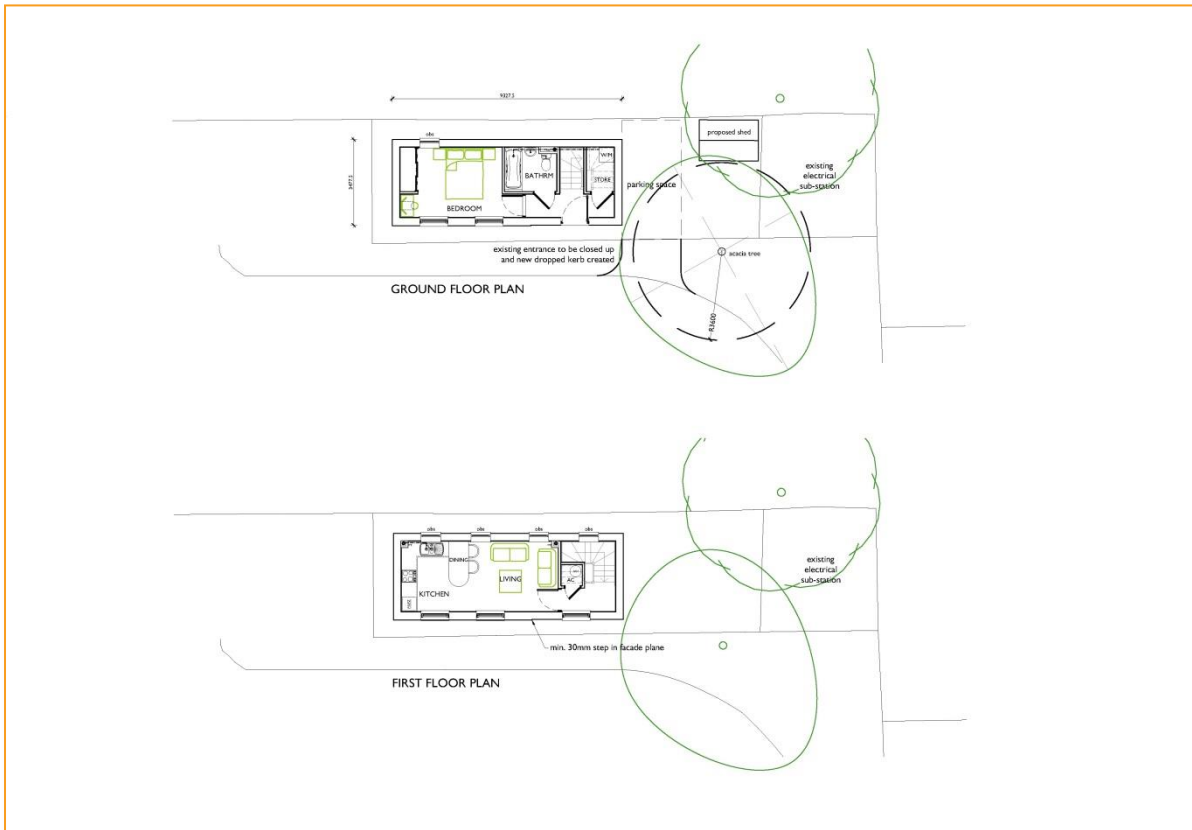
Proposed Ground and First Floor Plans of New Dwelling to the Land off Taylor Close Courtesy of Aquinna homes.
